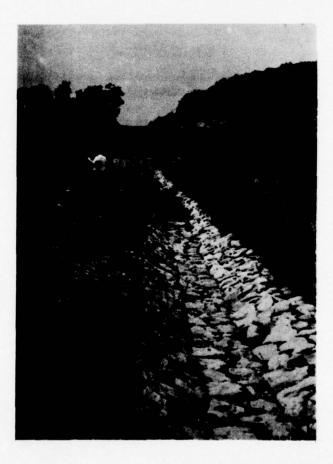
View of stone paved drainage ditch on north side of wall (Photo taken August 3, 1978).
